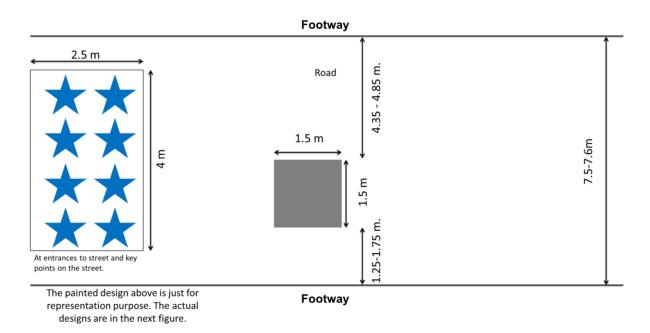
Ridgeway Road – Design of Community Corner, Carriageway details
